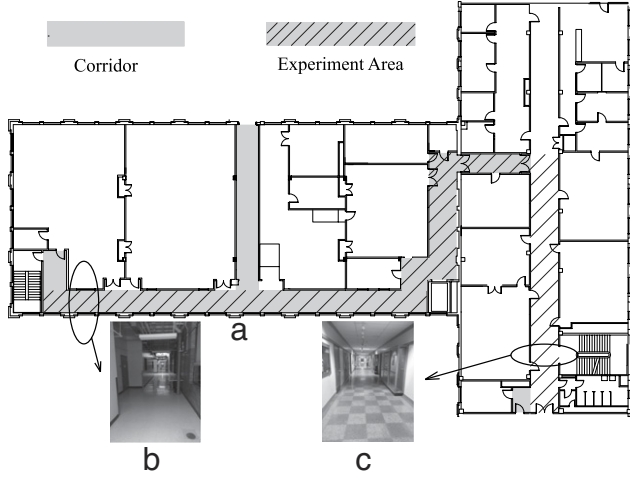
Experiment area in ME Building: (a) floor plan of the second floor and we take measurements on the shaded area; (b), (c) the snapshot of two ends of the corridor, having positions circled on the floor plan.
